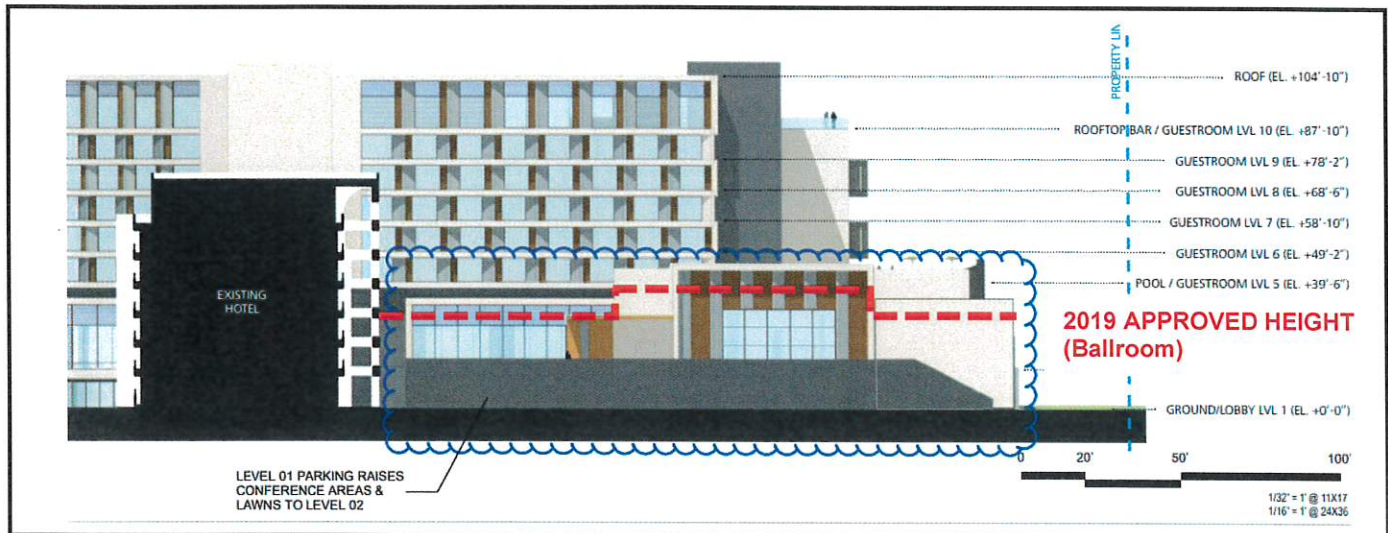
(2019 Approved Building Height and Proposed Building Height)
